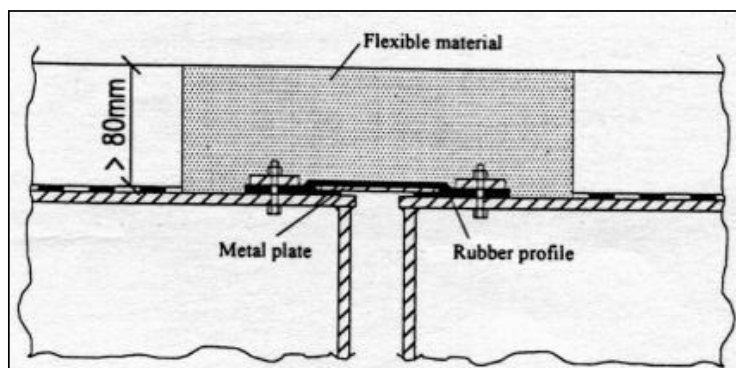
Asphaltic Plug Joint Additional Sealed by a Rubber Profile
